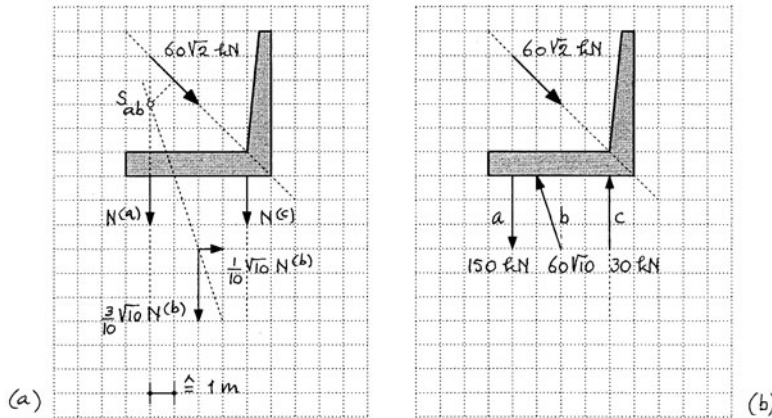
(a) The isolated retaining wall, in which it has been assumed that all the piles exert tensile forces on the bottom plate; (b) the pile forces as they really act on the bottom plate.
